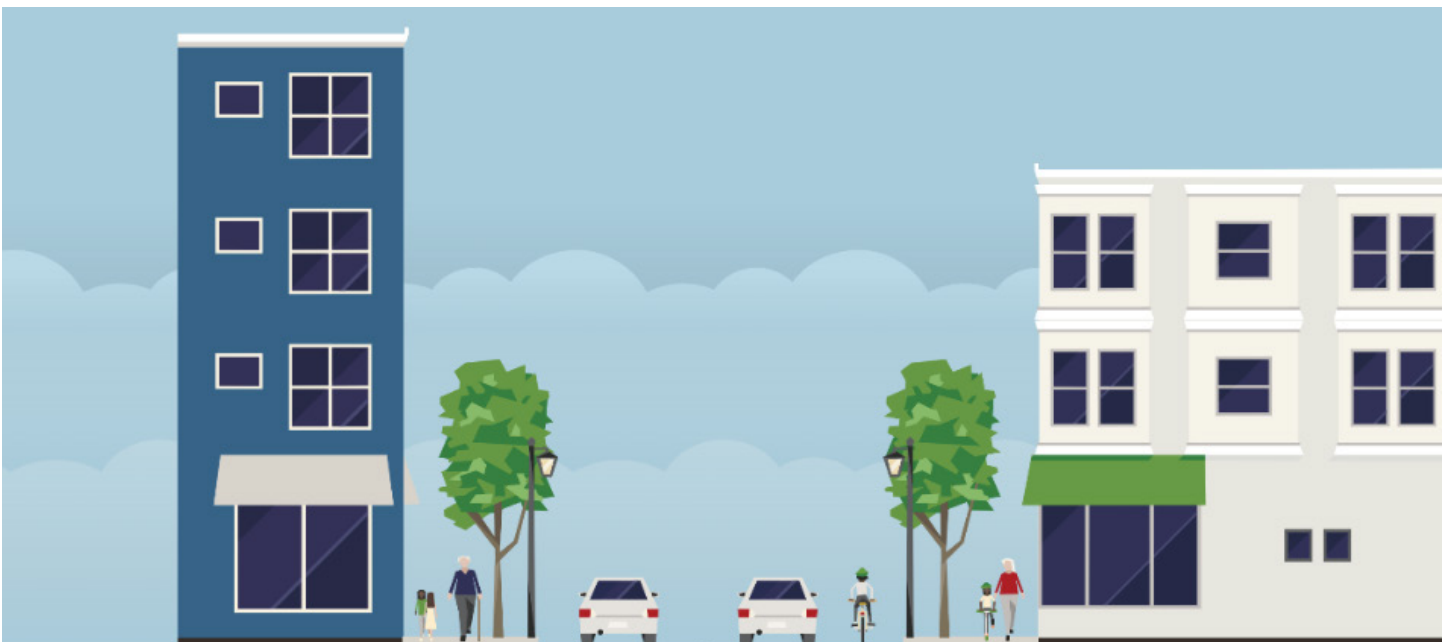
Example one-way street cross-section presented to stakeholder committee at March 4, 2025 meeting. This example was developed by staff based on Northgate street specifications using Streetmix software.
